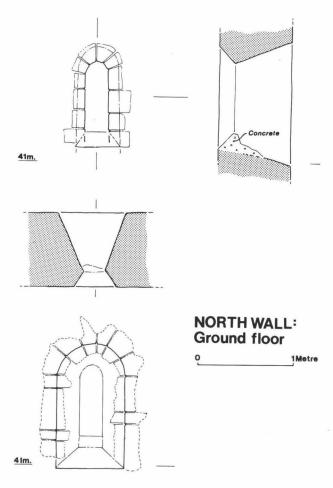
The Period I (Anglo-Saxon) window in the north wall.
